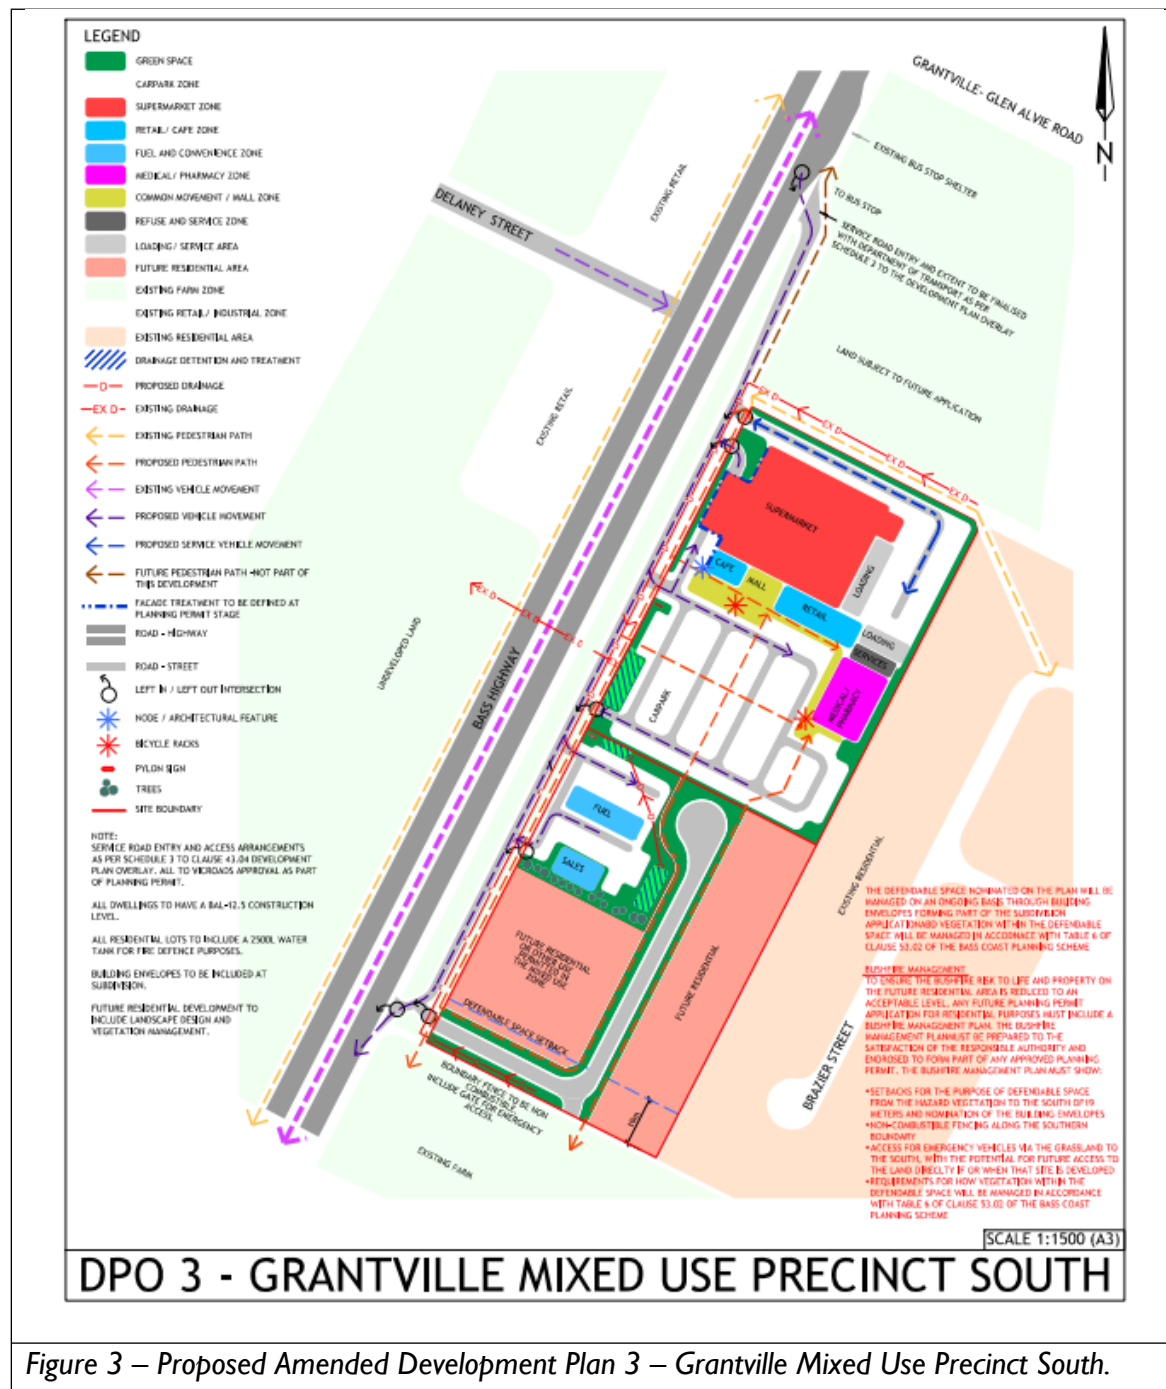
Proposed Amended Development Plan 3 – Grantville Mixed Use Precinct South.
